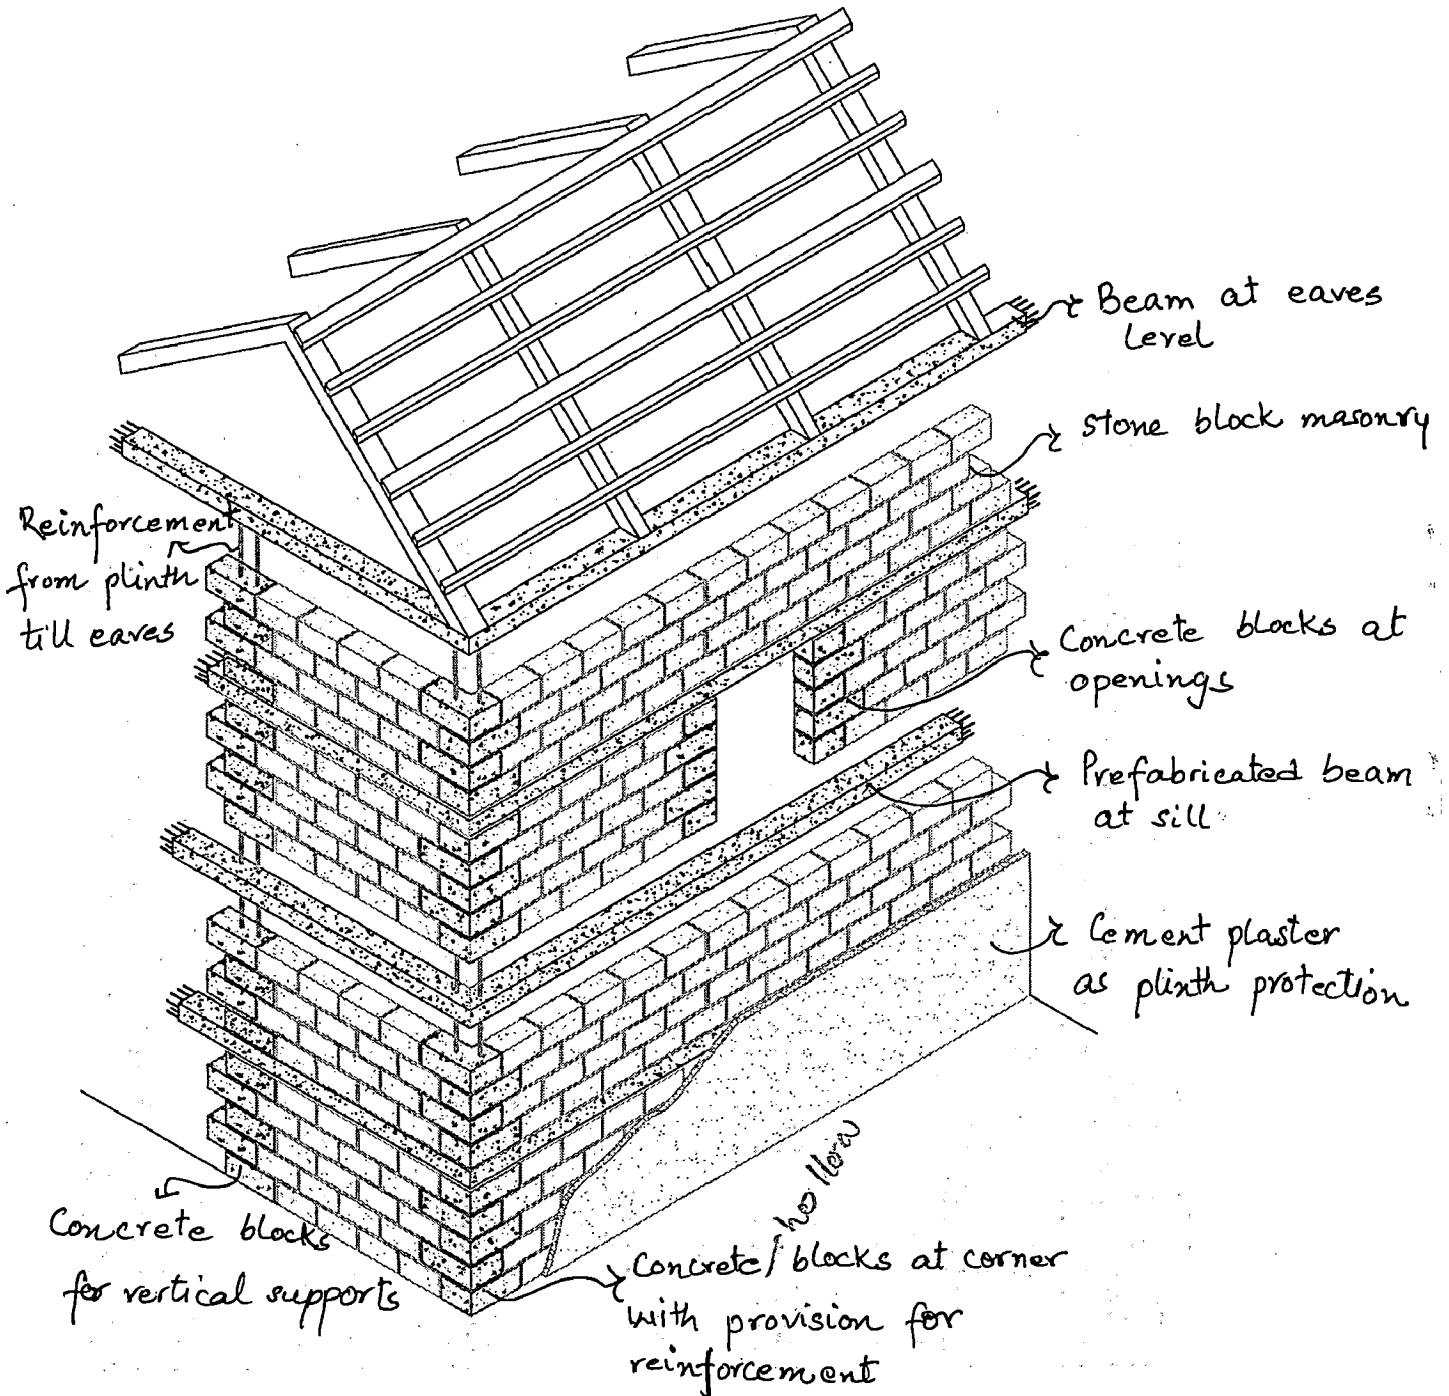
Sketch showing use of stone blocks, concrete blocks and prefabricated beams as a potential construction technique
